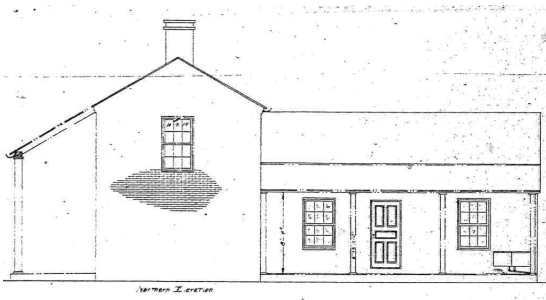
Northern elevation from 1922 "Repairs & Improvements" to Assistant Keeper's Dwelling.
